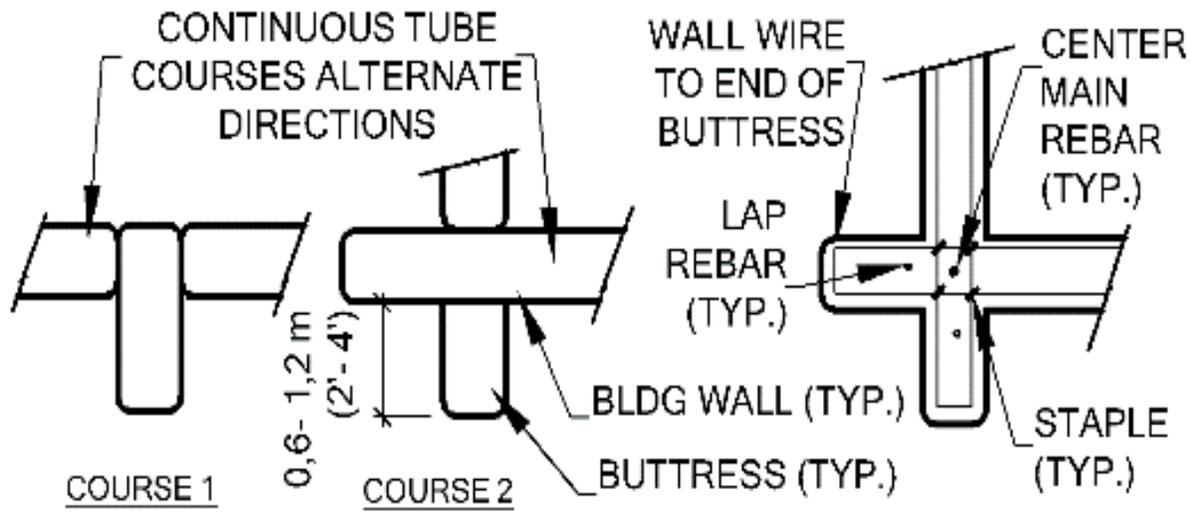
Continuous tubes and barbed wire unite walls to piers (left to right): a- Mid-wall buttress; b- Corner buttress tube layout; c- Corner buttress barbed wire and rebar.
